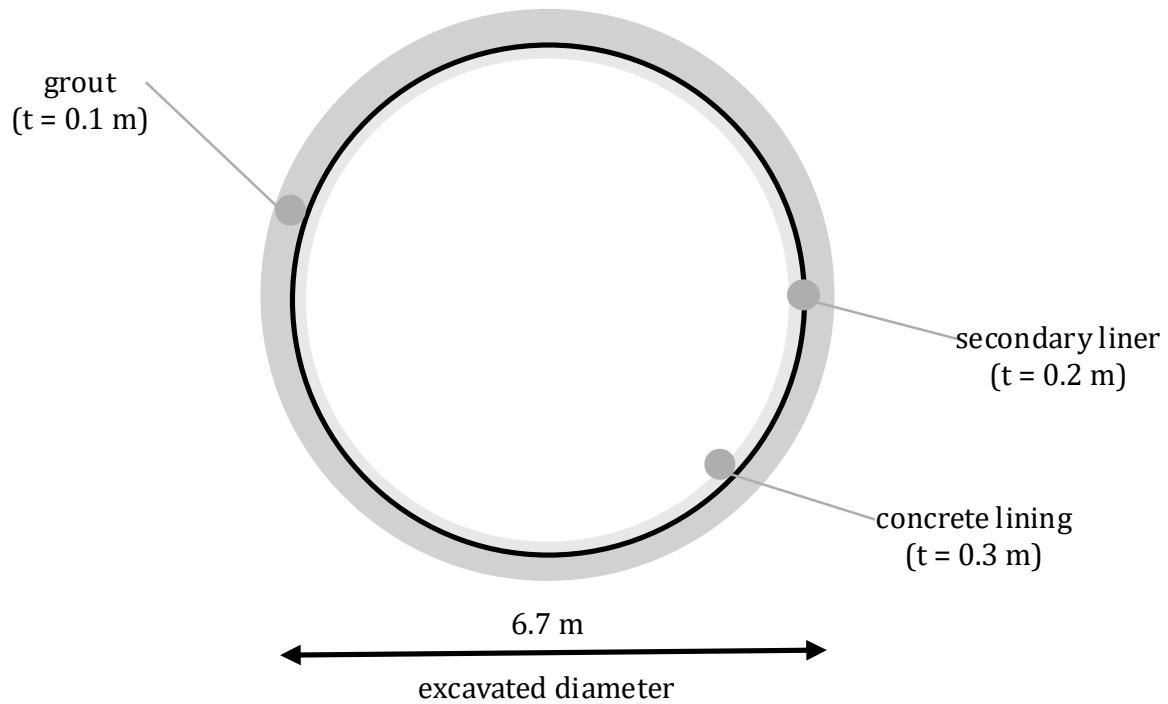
Cross-section of tunnel lining with marked thicknesses of each layer.
